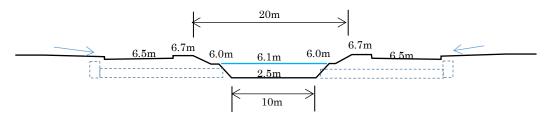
(4)-3 Plan for the Araihazar main road cana
